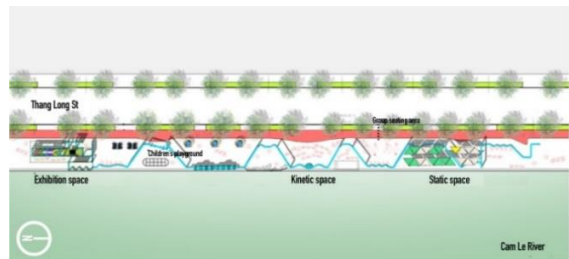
Master plan of proposed design model on Thang Long sidewalk
